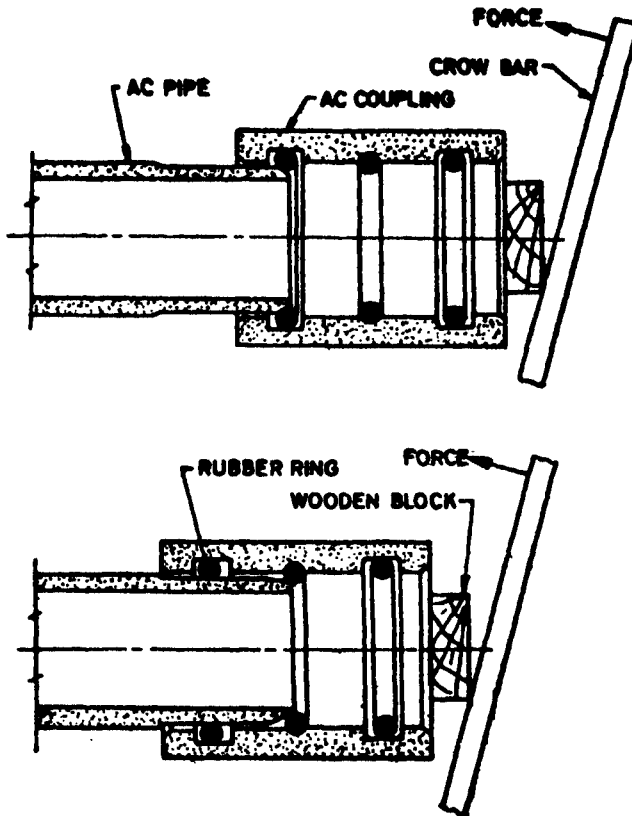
ASBESTOS CEMENT COUPLING JOINT
